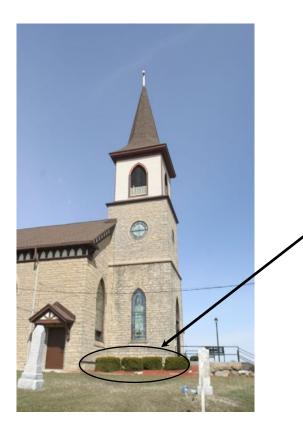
Exhibit E Stone and Mortar Pieces Falling from the Bell Tower
